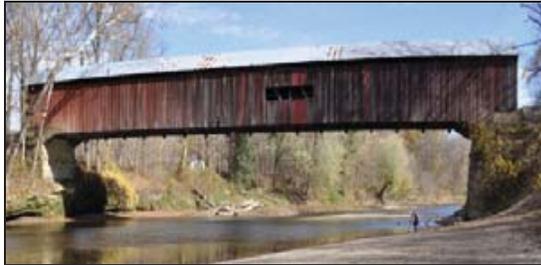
Elevation view of the Portland Mills Burr-arch truss
